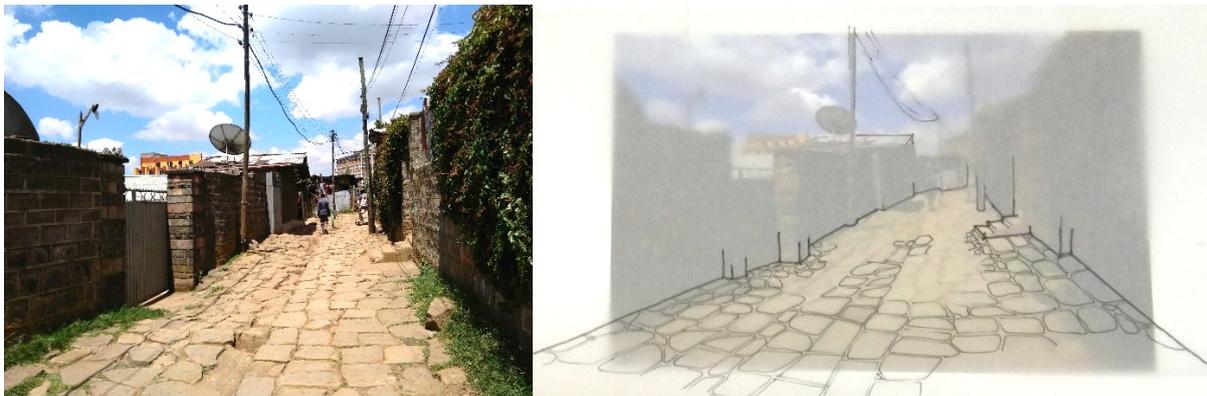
(a) Illustrates existing stone pavement; and (b) Schematic sketch showing improvement proposal.
